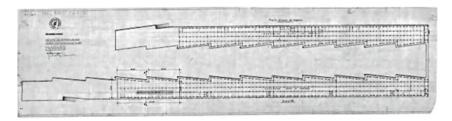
State Railways Project Office, Plan of the Warehouse building, undated, FF.SS. Archive Milan
